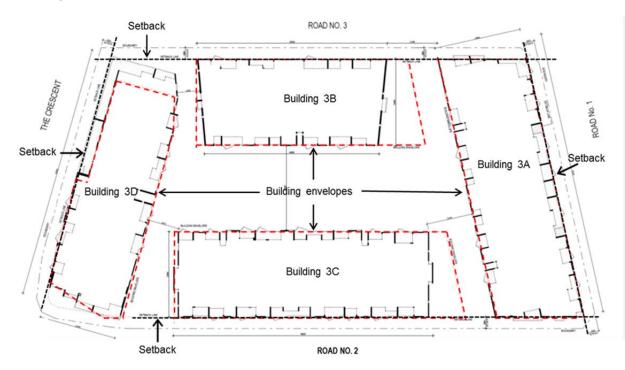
Proposed buildings against Stage 1 approved building envelopes and setbacks
